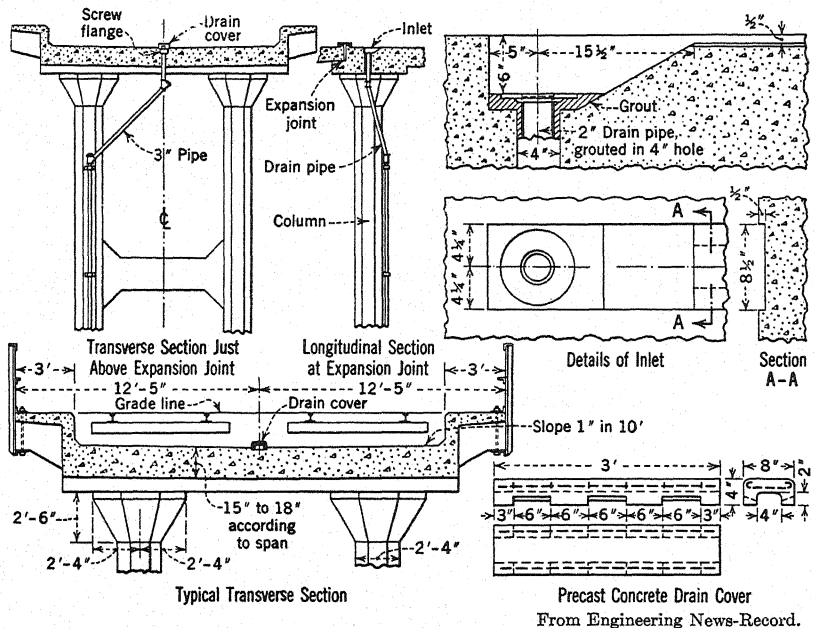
Drainage Details, Flat-Slab Railroad Bridge. (See p. 385.)
